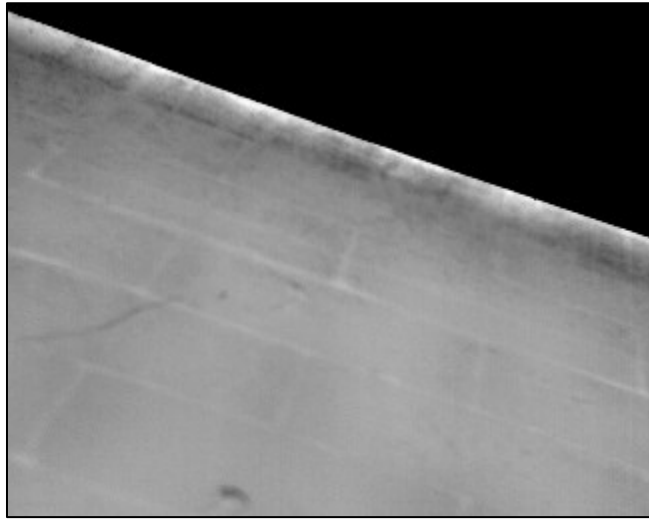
Thermal Image at Location 6 at 1:19 PM (North Side of Wall 2)
